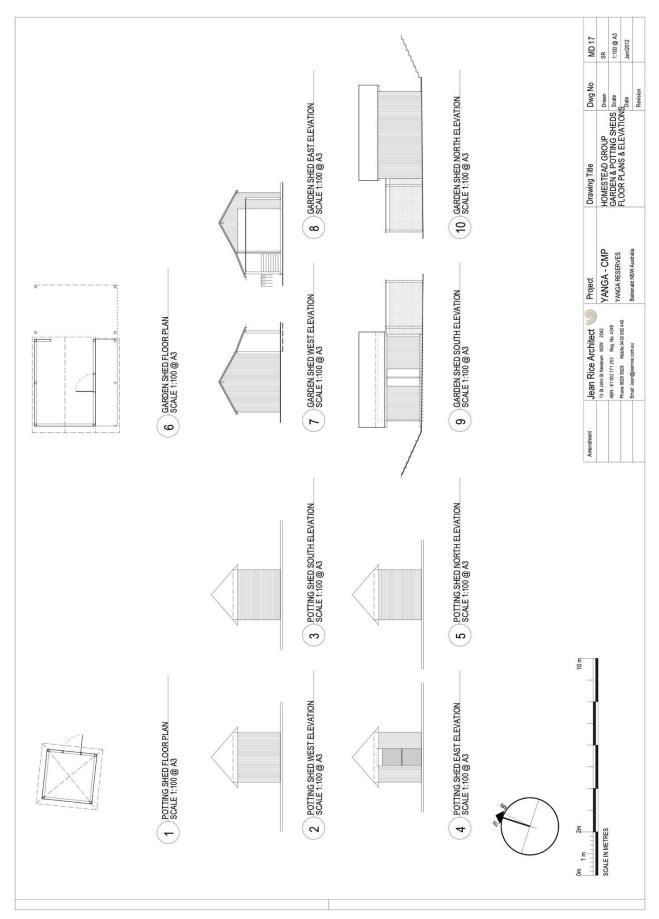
Homestead Group Garden Shed and Potting Shed plans & elevations. Jean Rice Architect, site assessment 2009.
